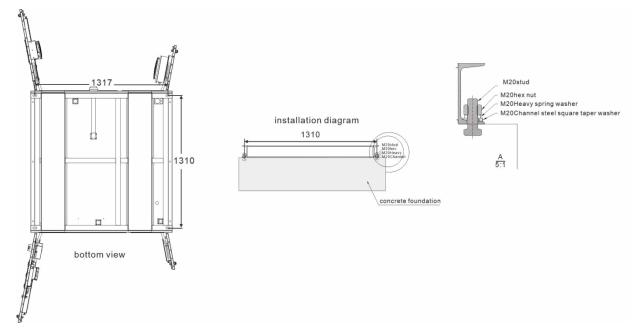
Schematic Diagram for Installation and Fixing of Outdoor Energy Storage Cabinet with Ground Bolts
